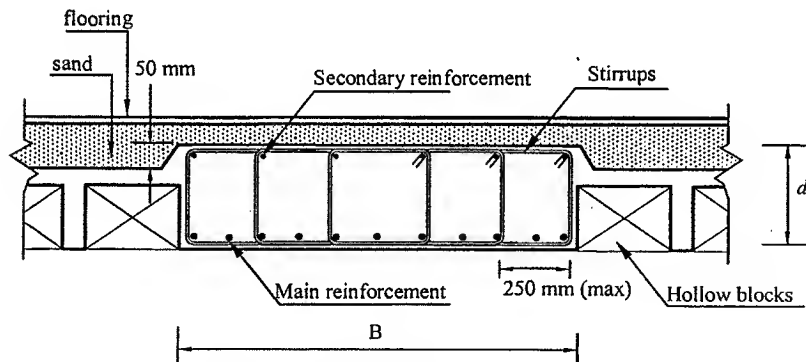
Reinforcement of a one way hollow blocks slab with hidden beams
